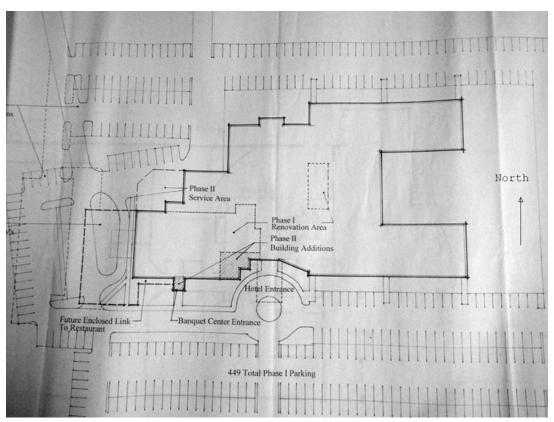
Planned T.G.I. Friday west end addition and other associated changes not built, August 25, 1994 (Building plans)
